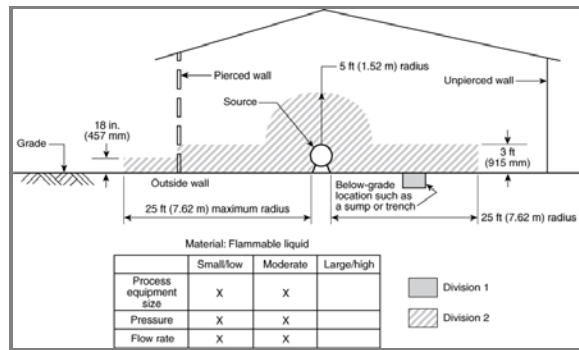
(f) Leakage Located Indoors, at Floor Level, Adjacent to an Opening in an Exterior Wall. Ventilation is not adequate. The material being handled is a flammable liquid.
